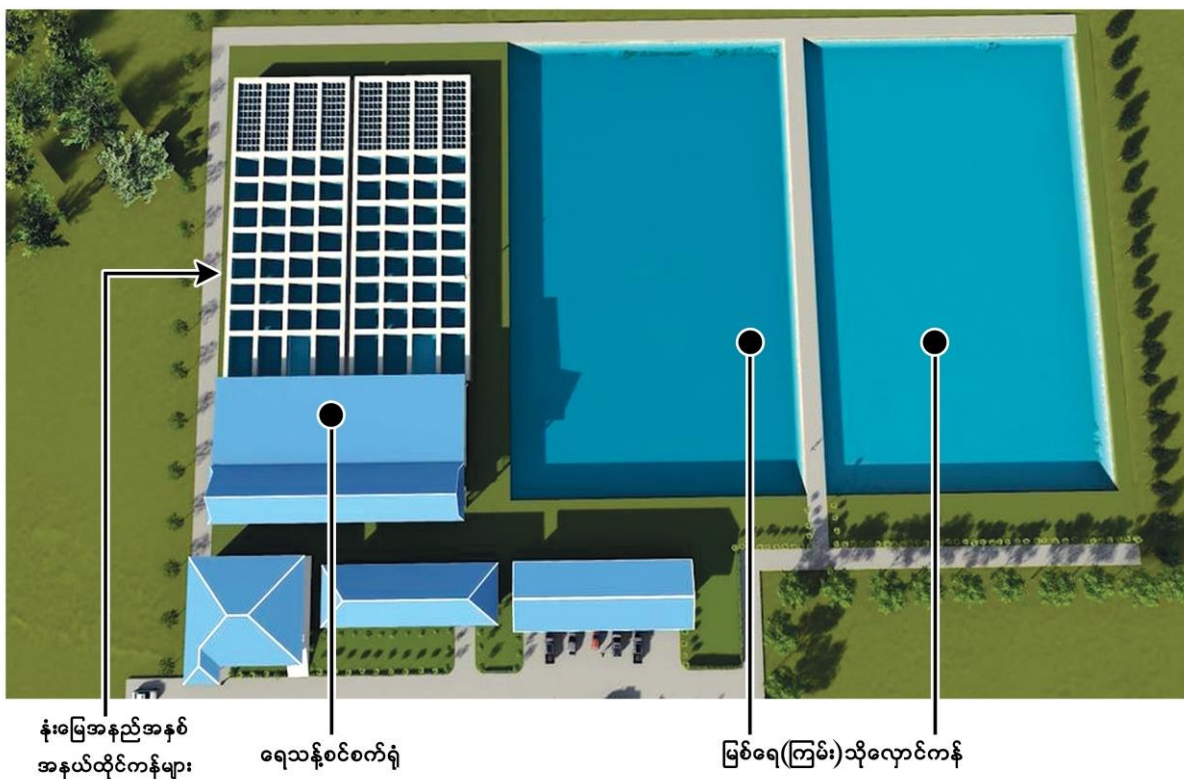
Conceptual Design Layout of Water Treatment Plant
